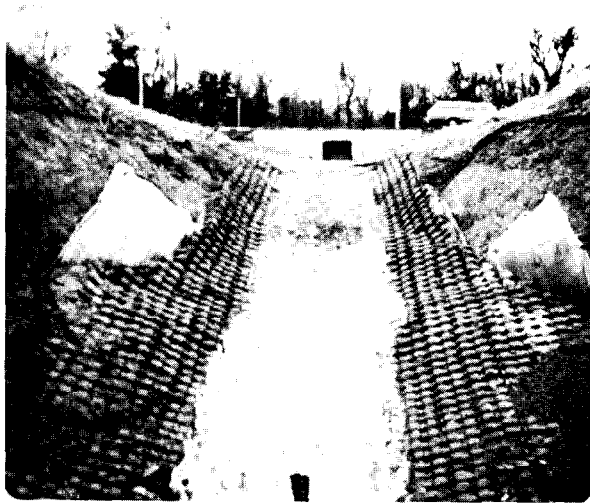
Drainage Chute Constructed with Cellular Concrete Paving Blocks. The blocks are over a non-woven plastic filter cloth. The chute drops the flow seven feet down a 2:1 slope.
